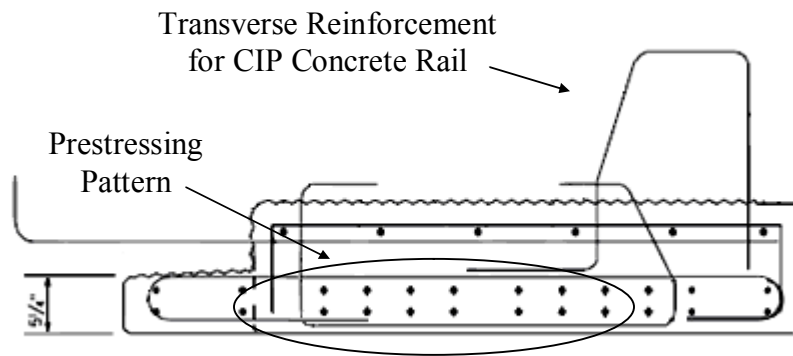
Cross-sectional view of exterior inverted-T precast section concept
